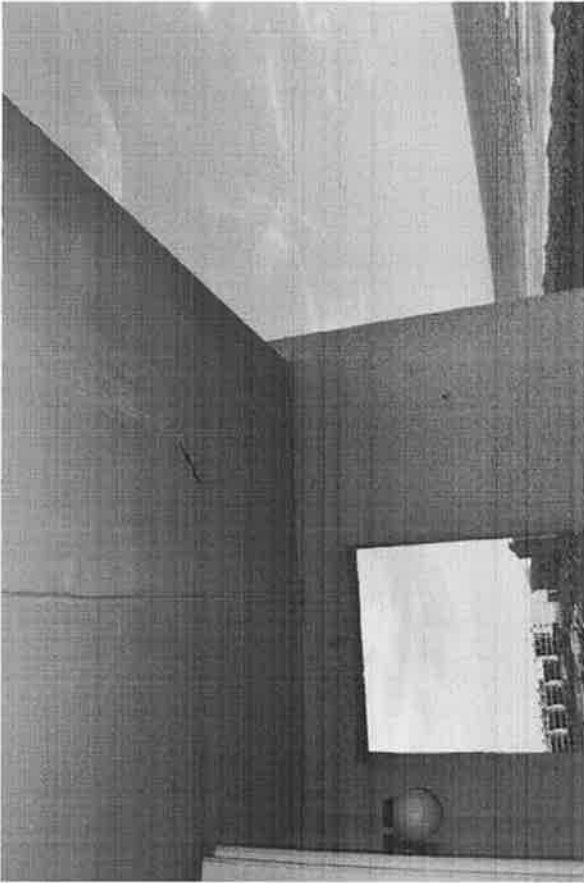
Close up view of existing repair to exposed surface of hollow core concrete panel at unit 1101 (typical)
